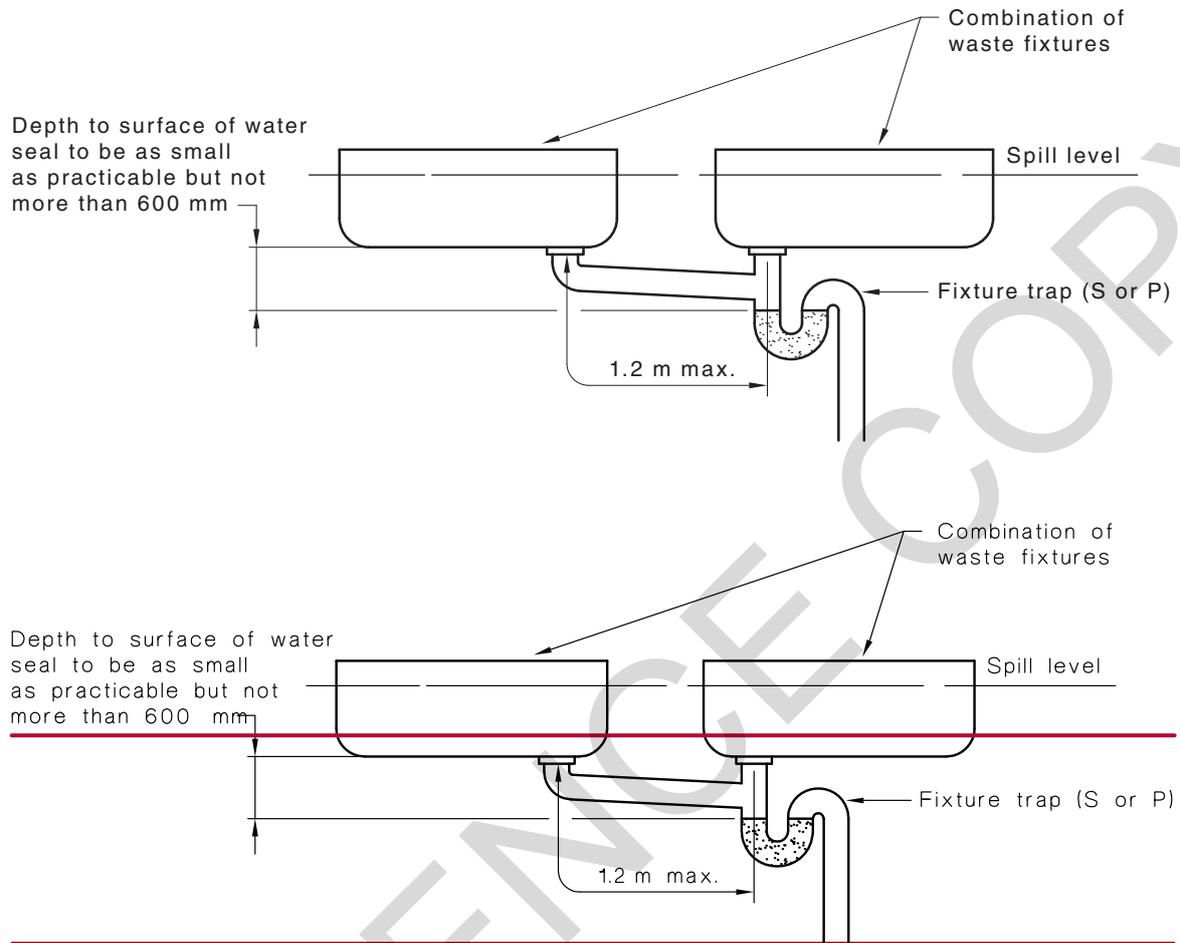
TYPICAL CONNECTION OF A FIXTURE PAIR
